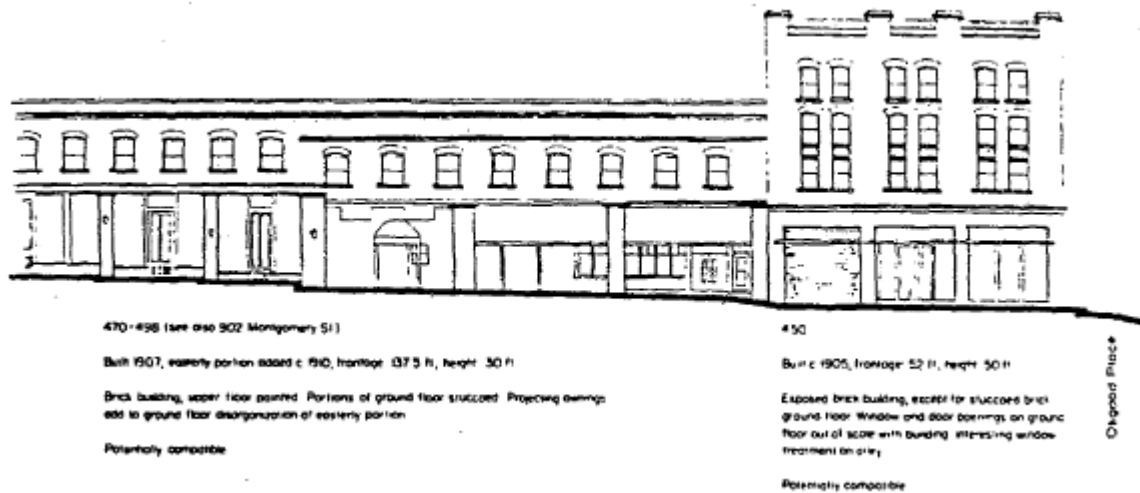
Façade elevations and architectural description diagram for the block of the subject building (subject building at right). Source: Jackson Square Report.
